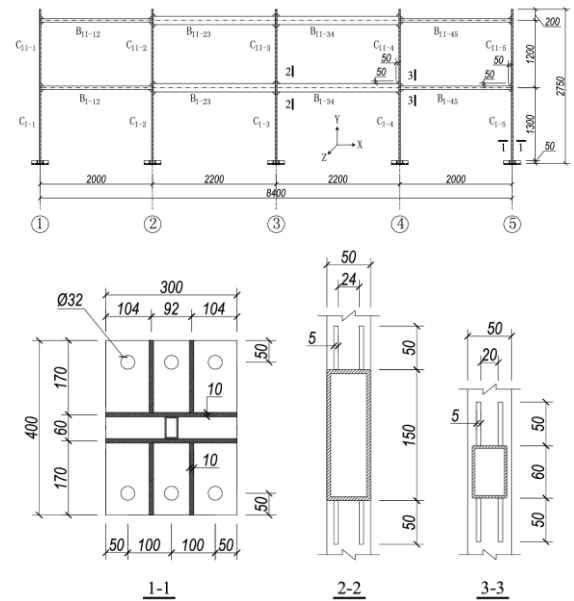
Test frame details (All dimensions are in millimetres) [9]
